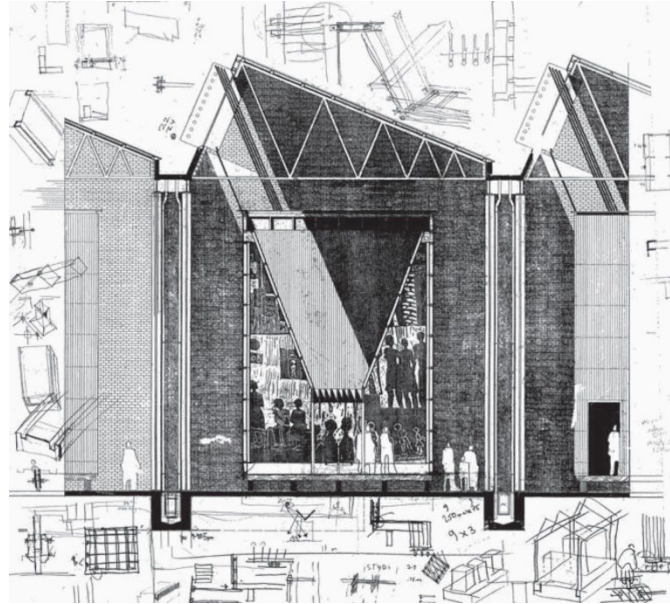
A section shows the structural system (Rinaldi, 2012)
